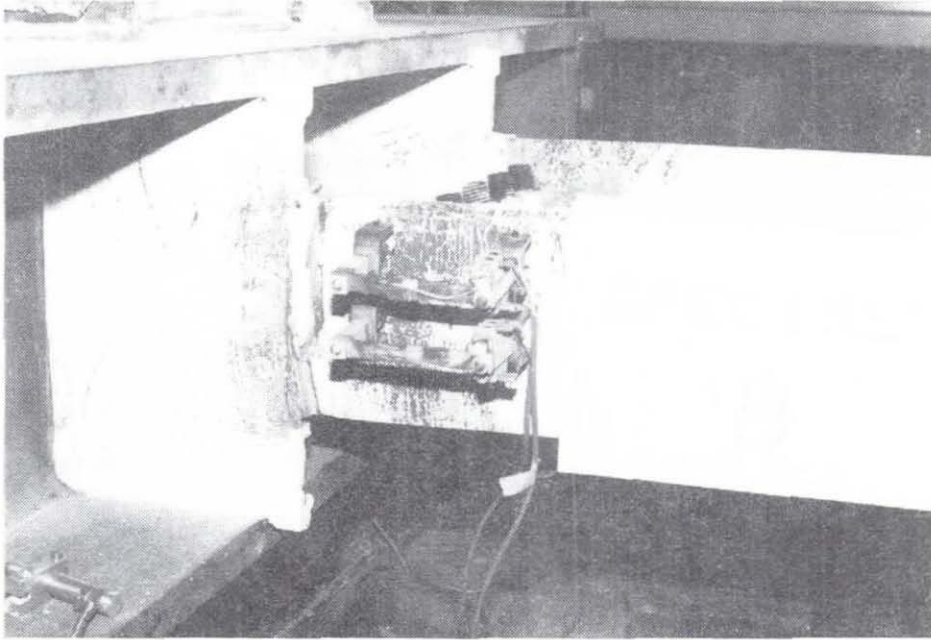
Fracture of Top Flange Weld (Specimen 6)
